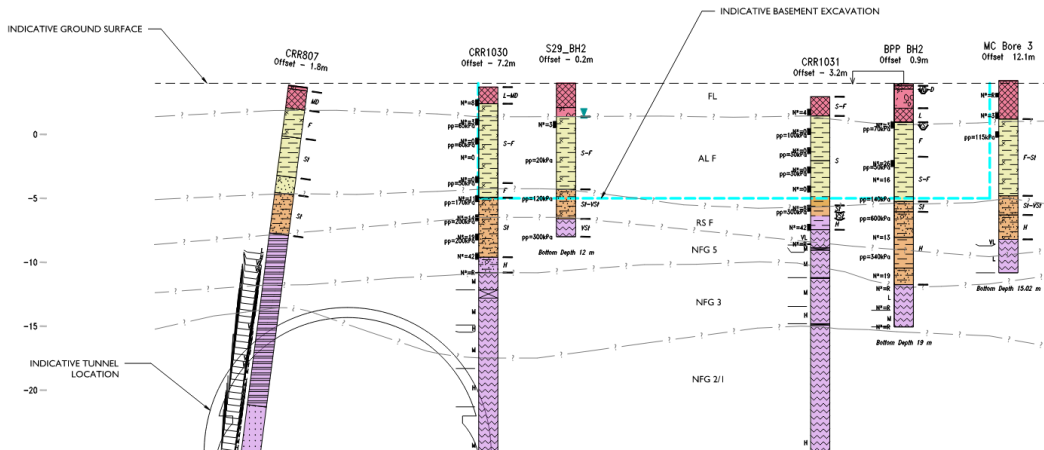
EDG Interpreted Geotechnical Section B – Looking towards The Sebel
